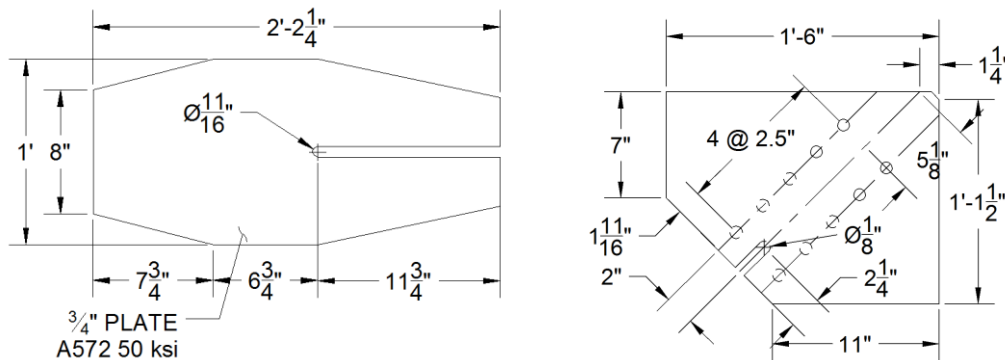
Shop Drawings for Knife Plate and Gusset Plate
